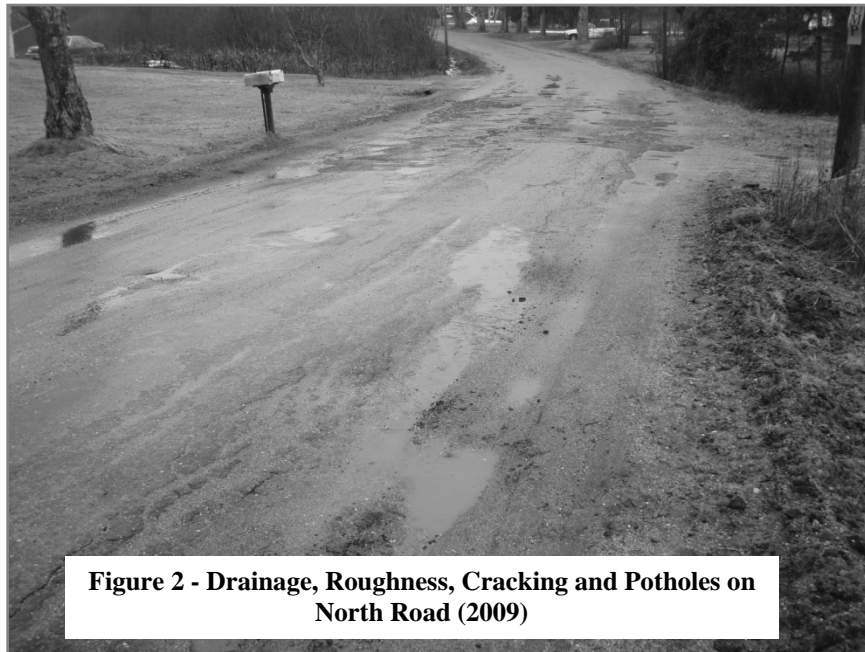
Drainage, Roughness, Cracking and Potholes on North Road (2009)
